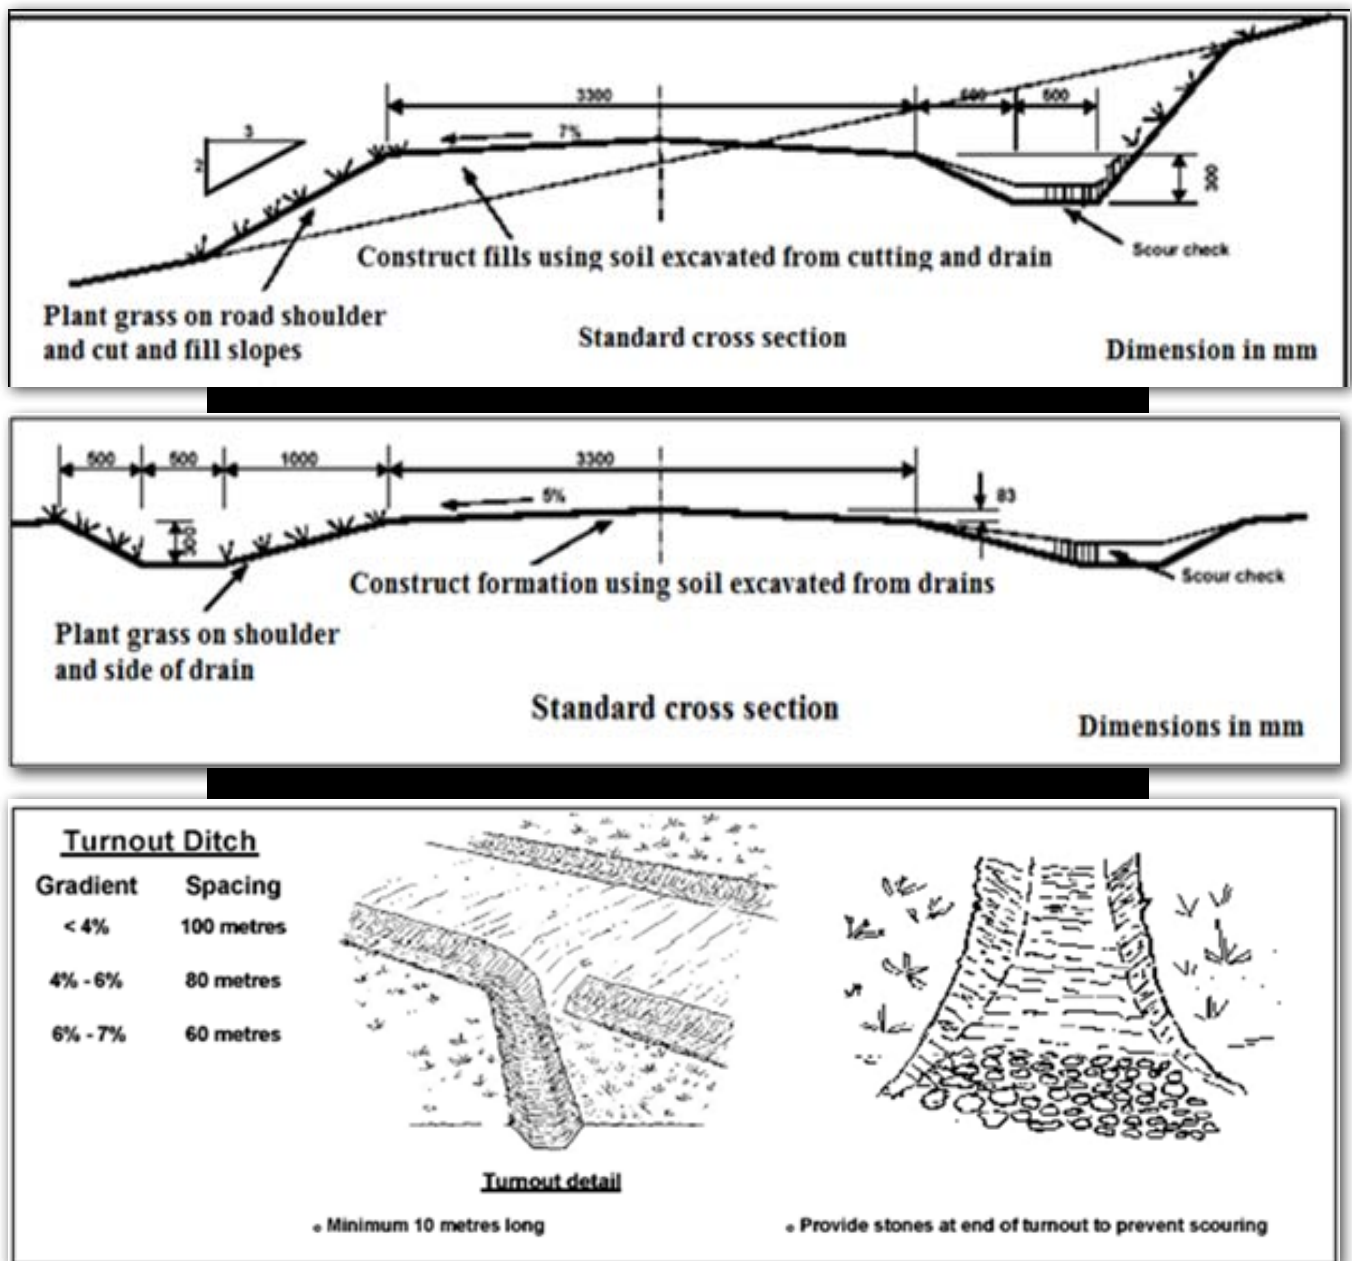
Labour intensive road construction on steps terrain (stable soil)
